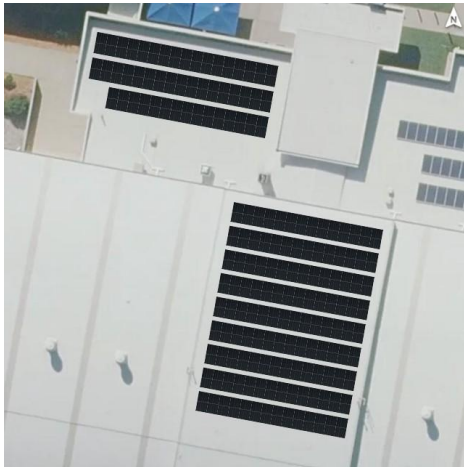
SPORTS DOME – 87.5 kW SOLAR ON THE ROOF AREA DIRECTLY ABOVE THE EXISTING SOLAR ARRAY AND THE ROOF SPACE OPPOSITE (MIRRORING) THE CURRENT INSTALLATION
